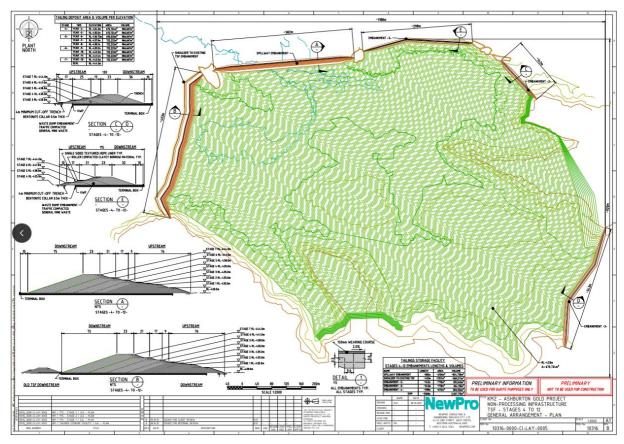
Proposed Location Stages 4-5 of the Tailings Storage Facility
